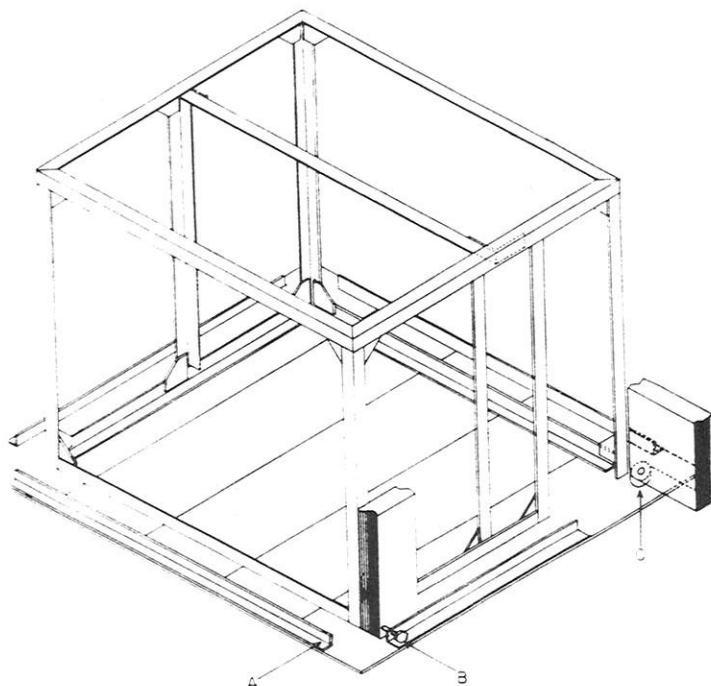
Construction details of steel room. (A) Angle iron used to clamp walls to frame with (B) log bolts. (C) Lower roller bearings which support steel door.
